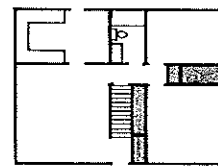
Floor plan of a one and one-half or two-story house with basement. 26'-0" x 36'-0".
